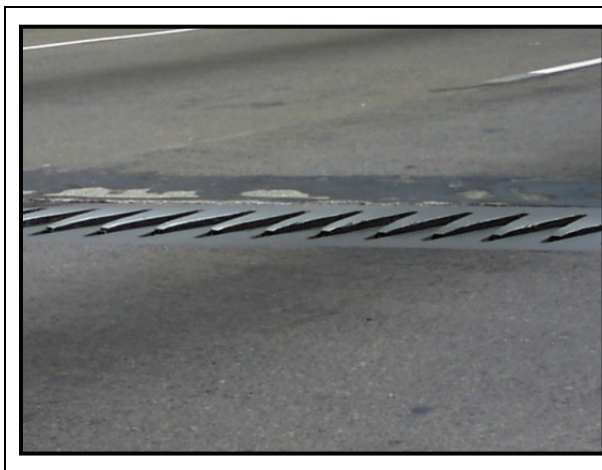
Minor Damage: Misaligned Finger Joint (MO)
